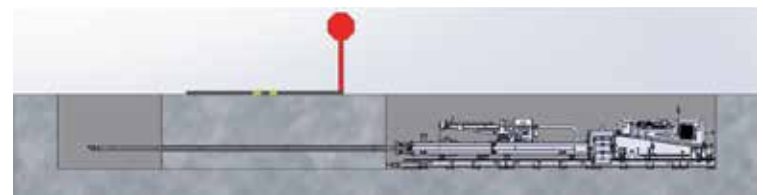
Excavated pit to excavated pit pilot installation.
